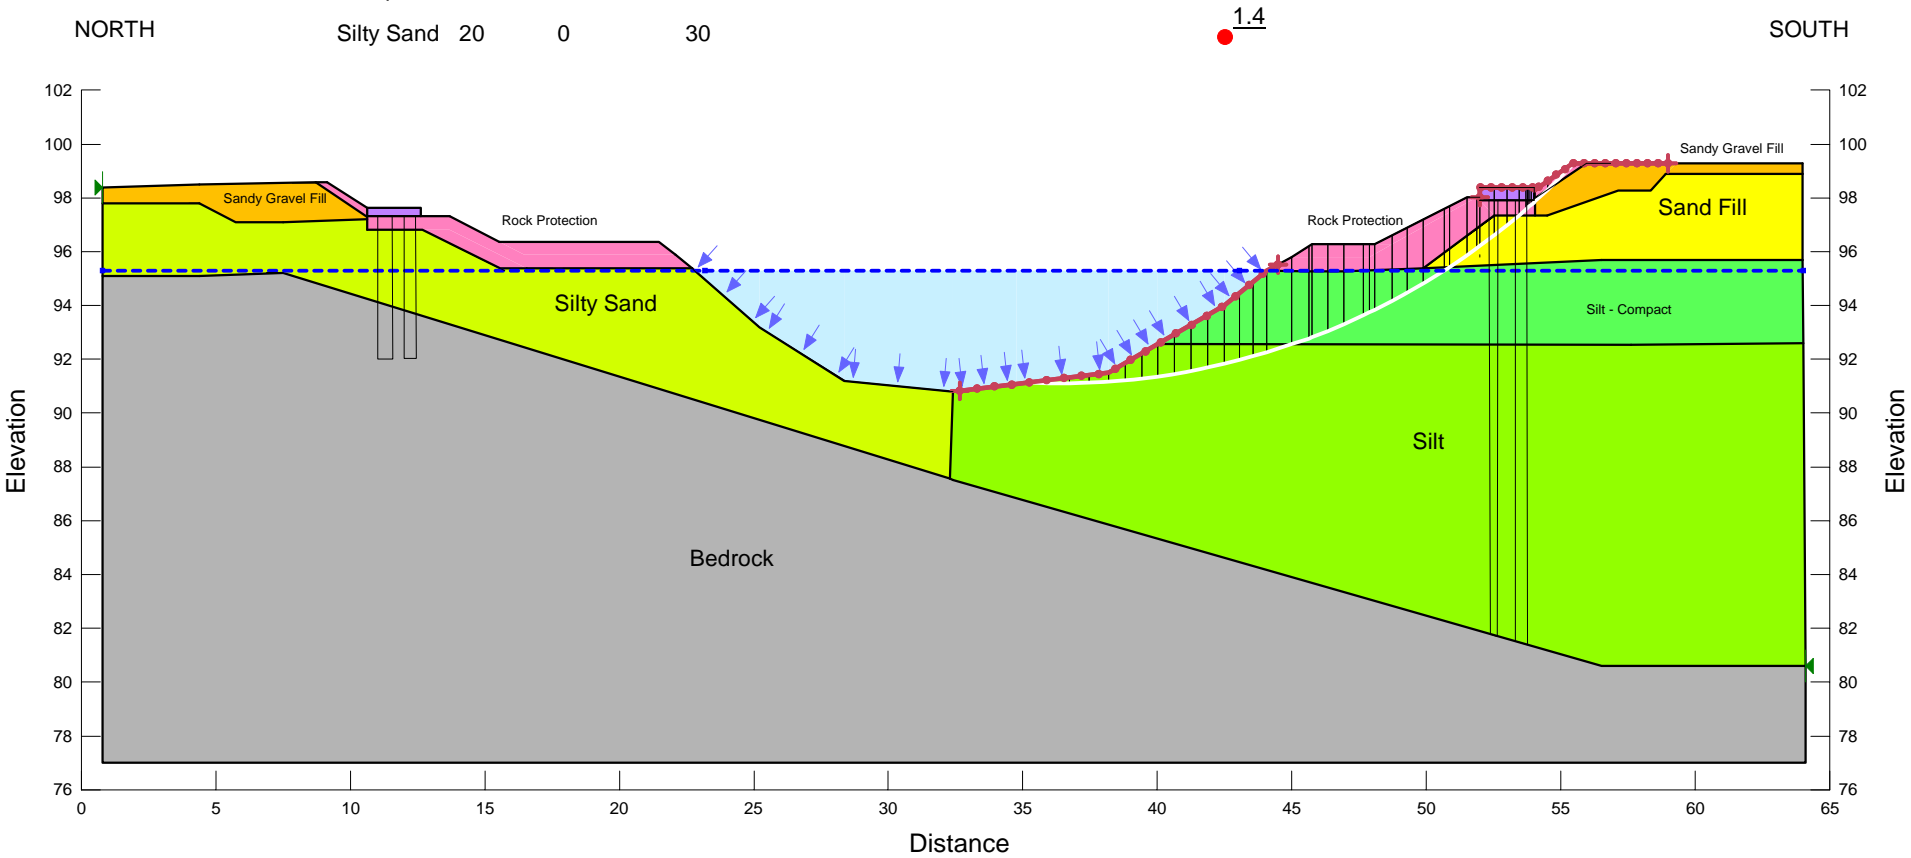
PROPOSED SOUTH SLOPE H-PILE FOUNDATION
